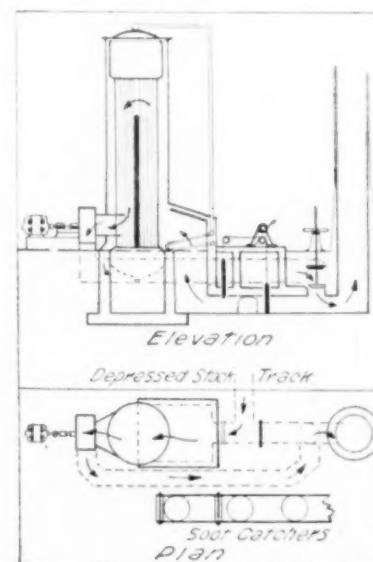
PLAN AND ELEVATION SHOWING ARRANGEMENT OF UNITS IN LARGE BOILER PLANT AND VERTICAL-SLIDING WASTE-GAS VALVES USED AT THE BOILERS
